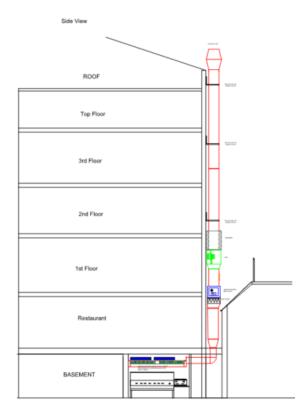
(above): 29 Tottenham Street (ref 2020/3277/P approved elevations showing location of extract duct
